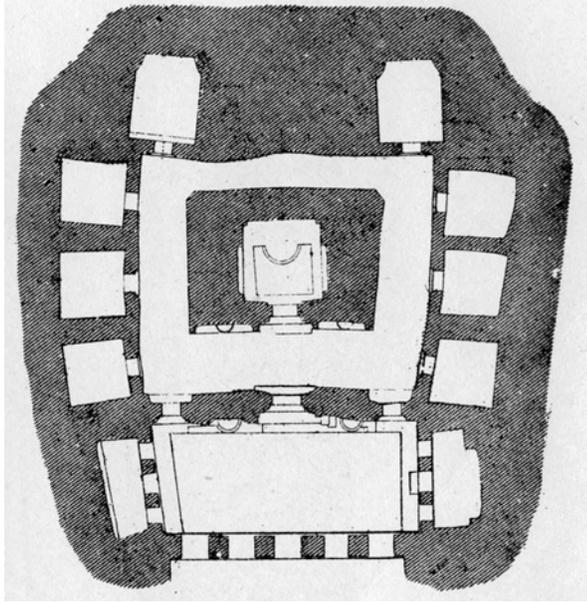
Aurangabad cave 7, plan (Burgess 1878).
